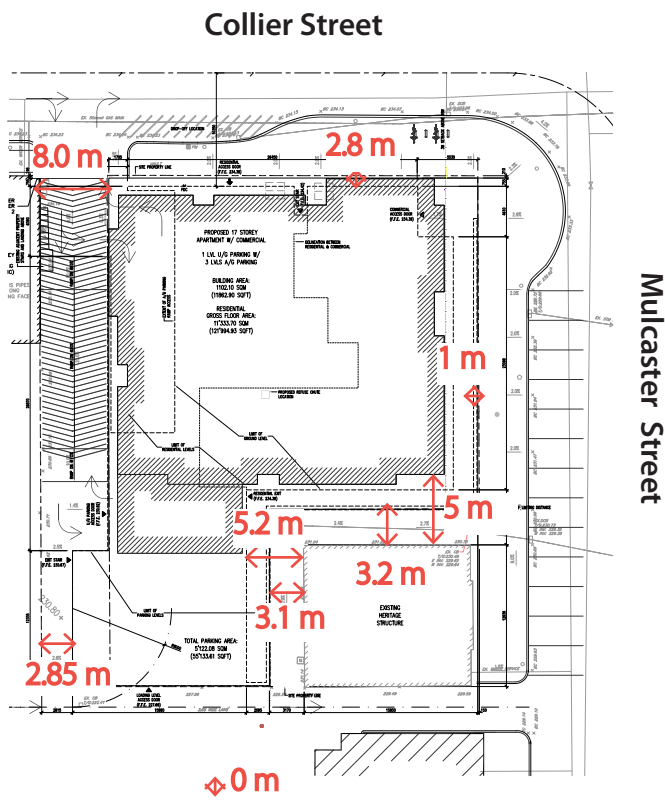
Proposed ground floor plan prepared by MCL Architects with setbacks.
